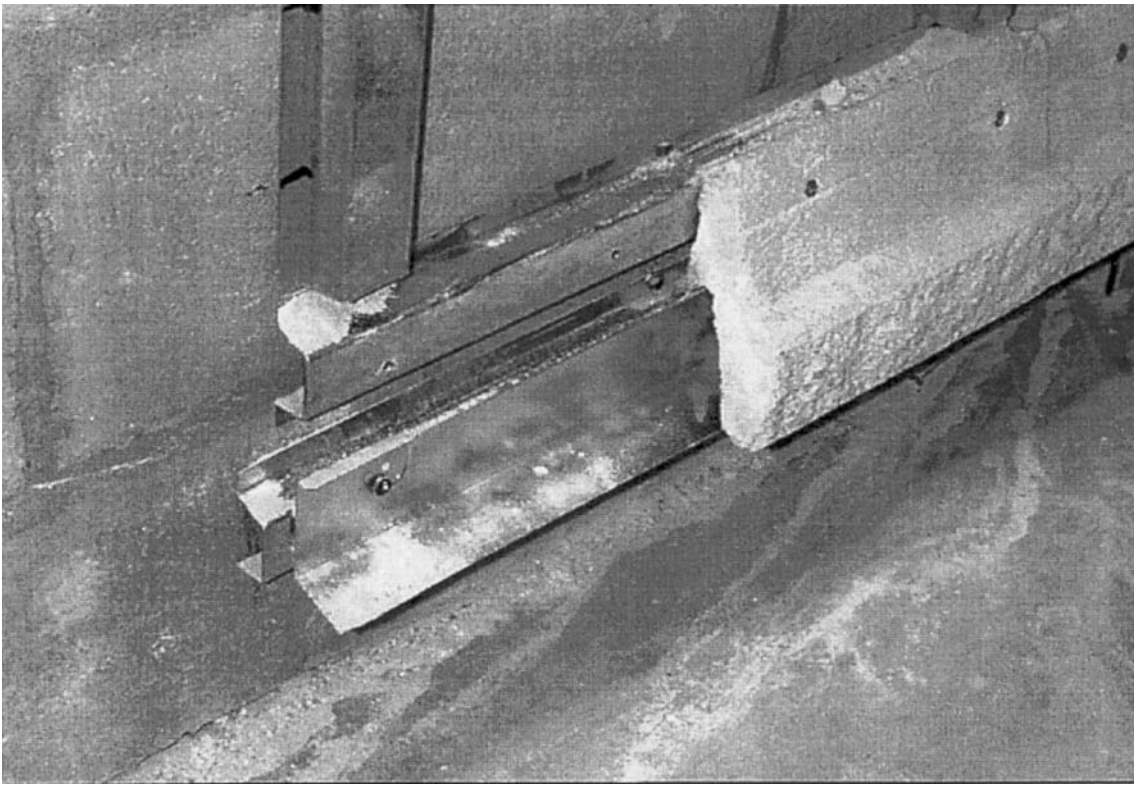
Wall base with steel furring : 2 horizontal furrings, 1 vertical furring and the "starter furring"
